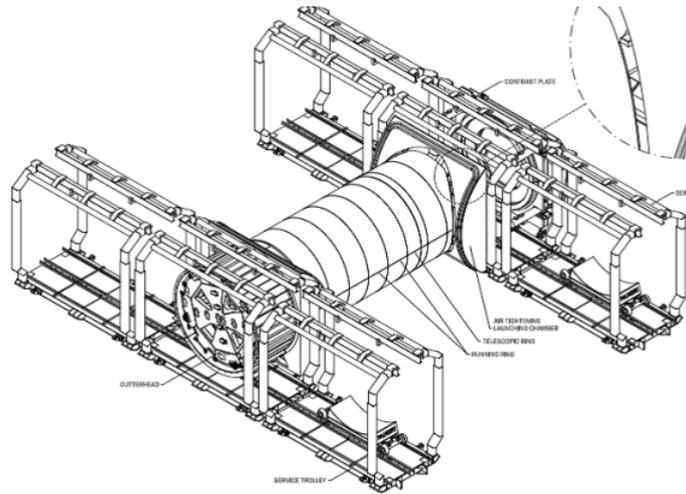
Isometric view of small scale secondary TBM (Courtesy: SWS Global Engineering, 2016)
